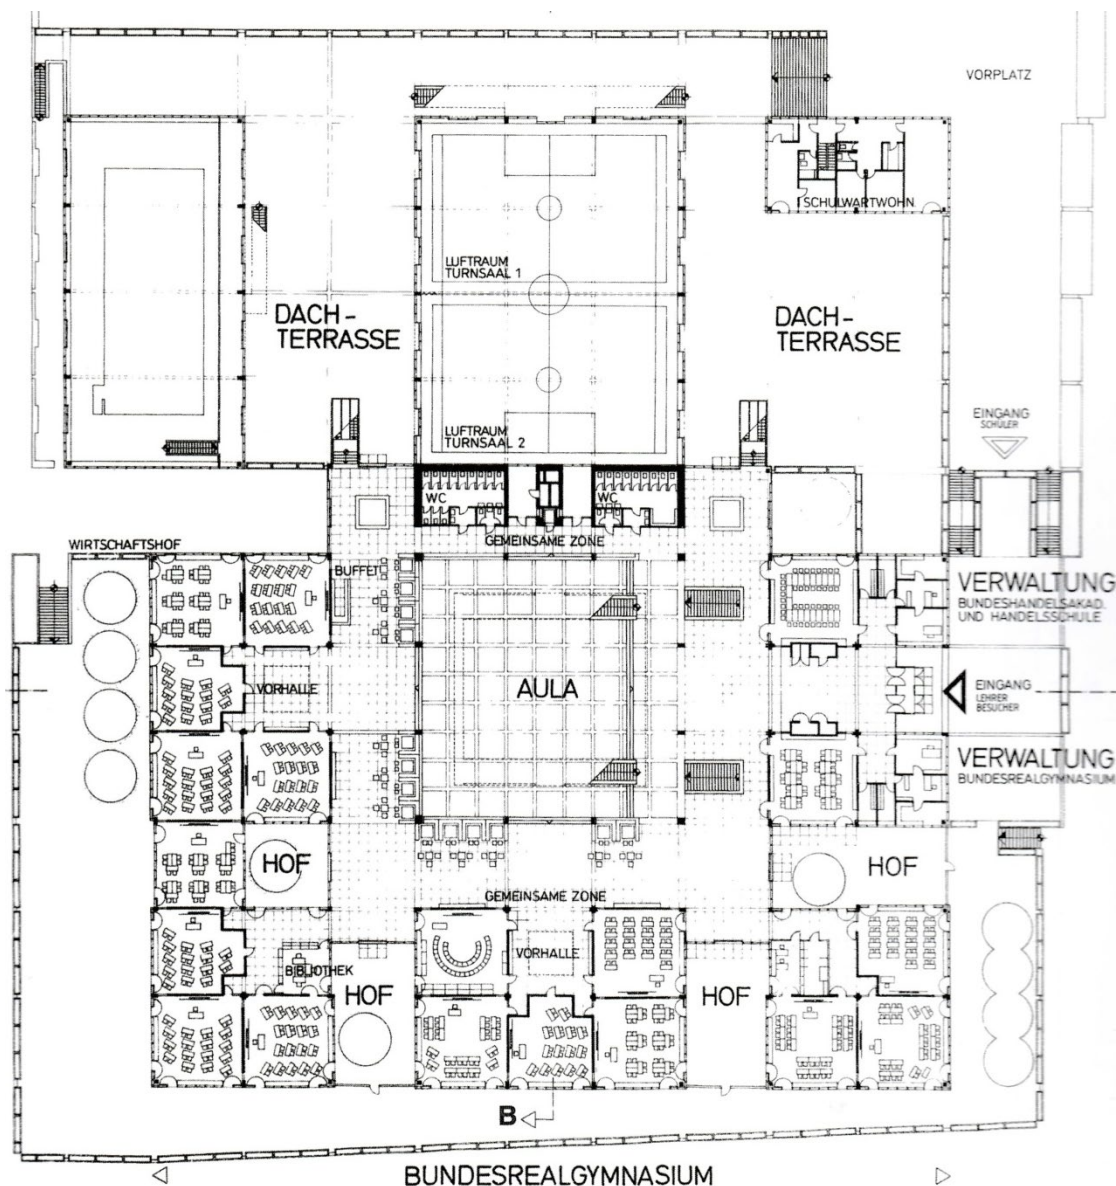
Floor plan ground floor. School center in Wörgl, Tyrol. Source: Hufnagl archive.
